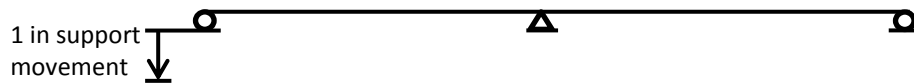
Finite Element Bridge Models Developed with RAMPS
